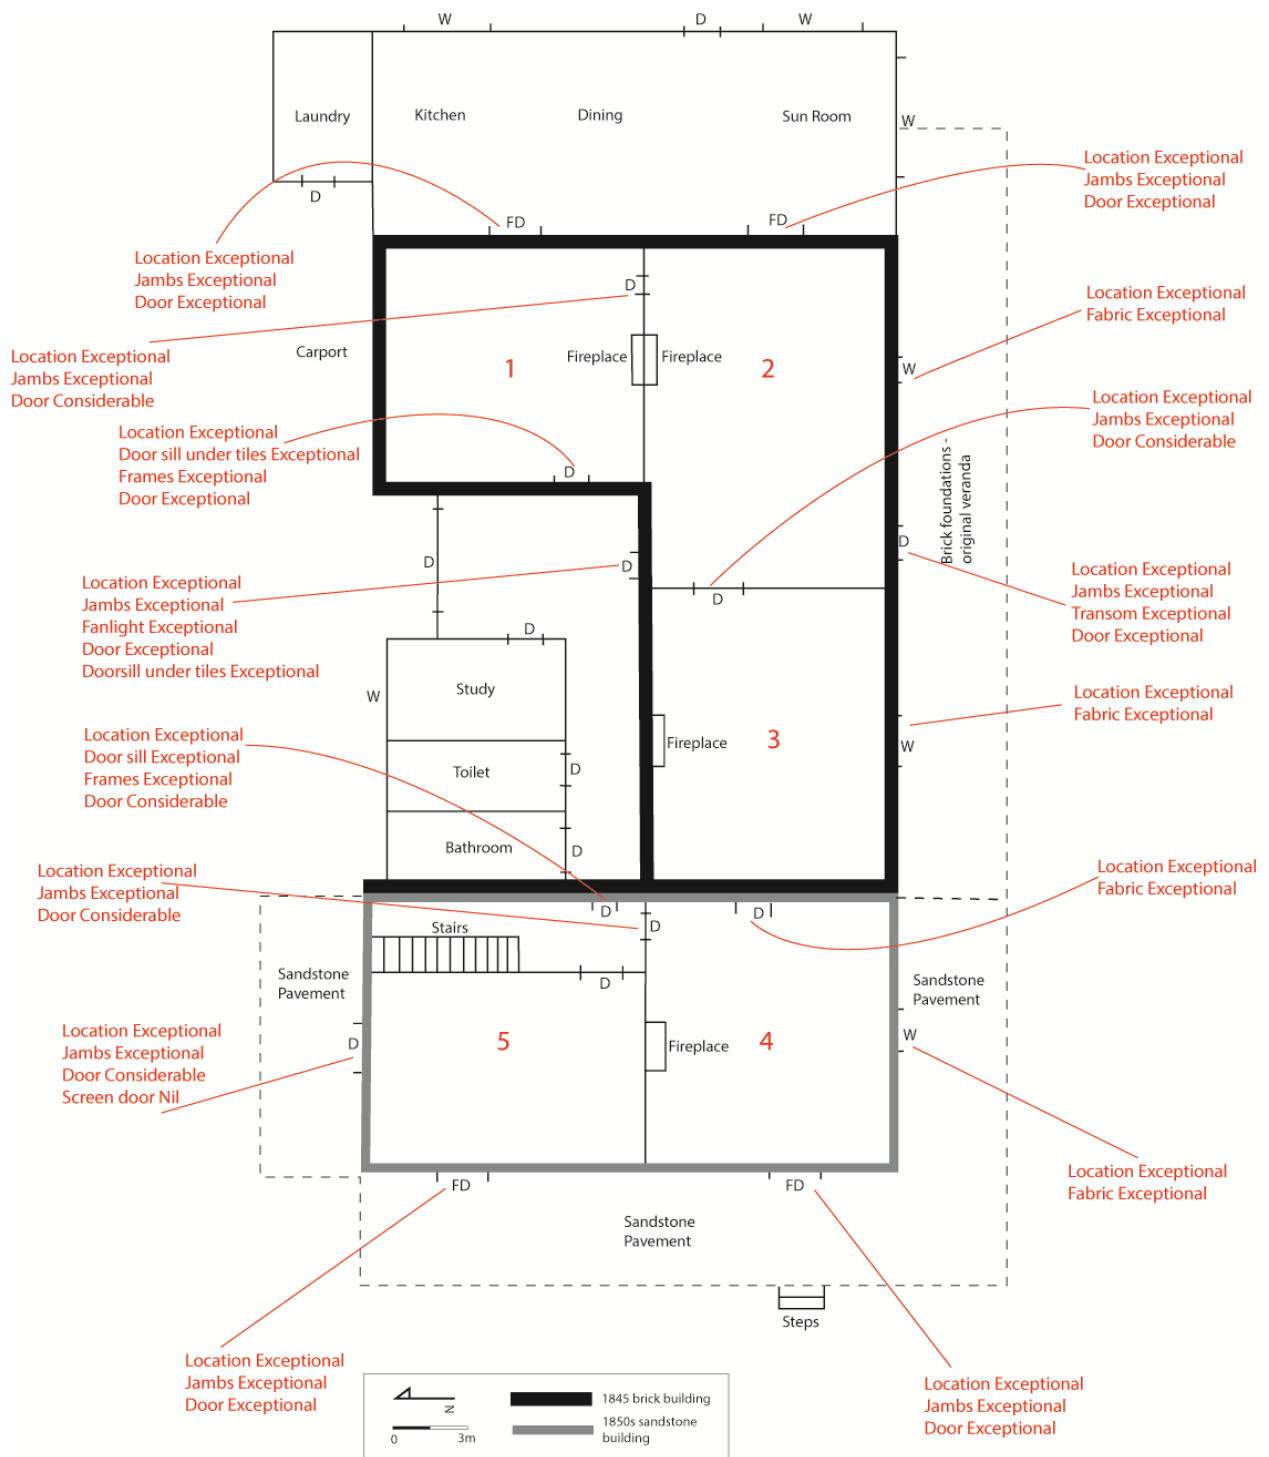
A plan of the lower floor of the c.1845 brick and c.1850s–60s sandstone sections of Negoa, showing the graded levels of significance of individual doors and windows
